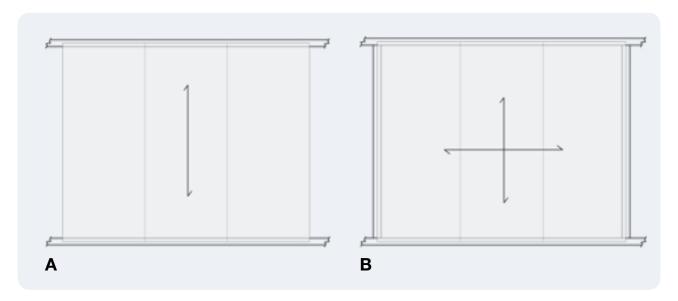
Framing options for CLT floors (a) CLT panels spanning one-way between primary beams and (b) CLT panels spanning two-way between primary beams and secondary beams.
